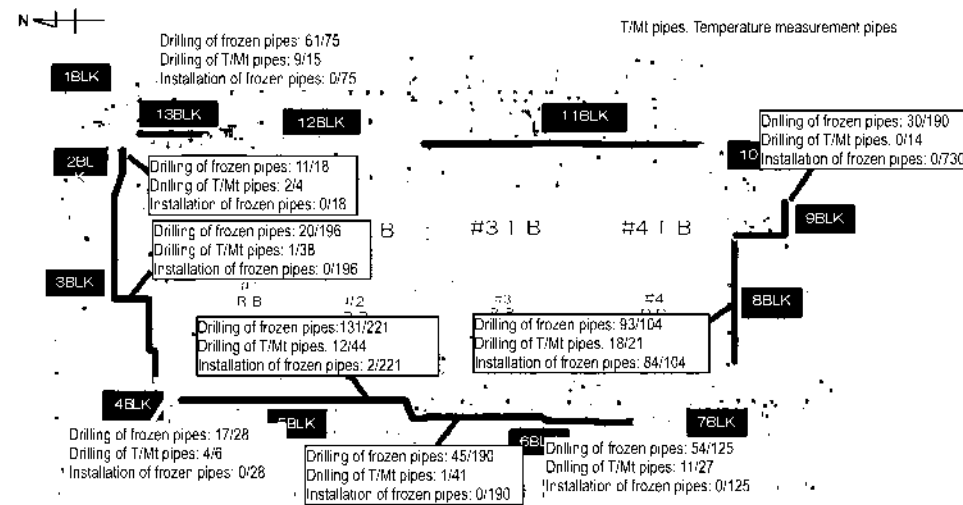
Status of drilling for frozen-soil impermeable walls and installation of frozen pipes
